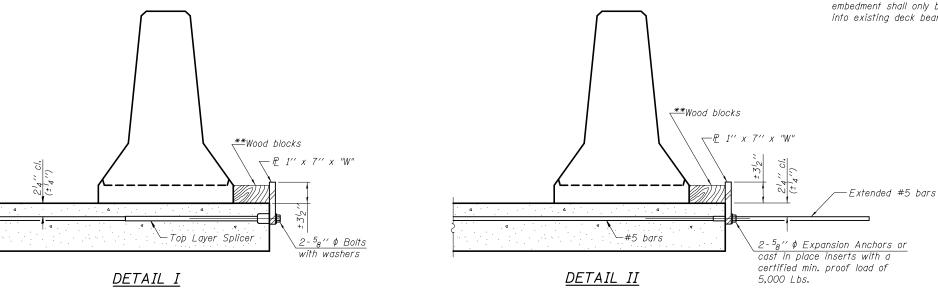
Detail I - With Bar Splicer or Couplers: Connect one (1) 1" x 7' 'x "W" steel P to the top layer of couplers with 2-58" \$\phi\$ bolts screwed to coupler at approximate & of each barrier panel.
